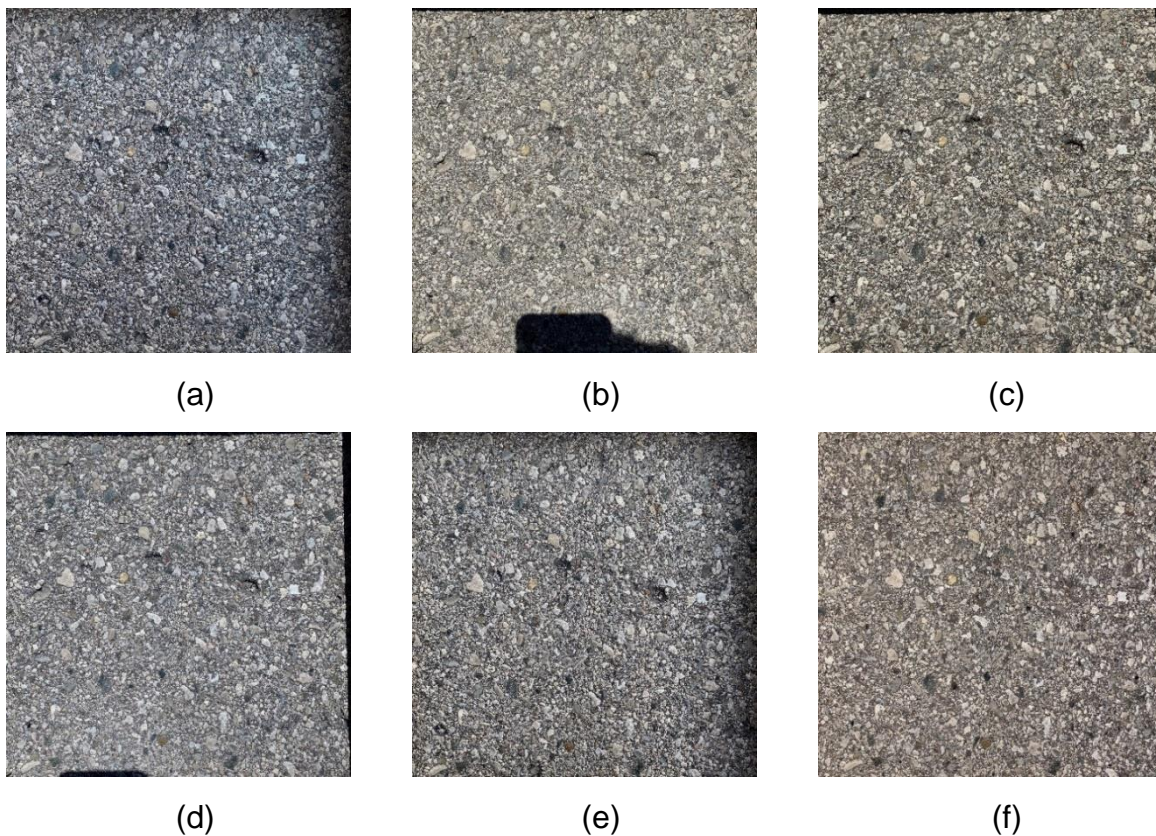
Asphalt pavement 'Location 1' at (a) sunrise, (b) noon, (c) noon at an angle, (d) noon with flash, (e) sunrise, (f) night with flash.
